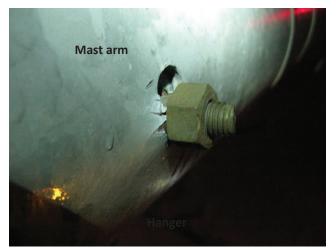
Tear in bolt hole in mast arm at bolted slip joint
